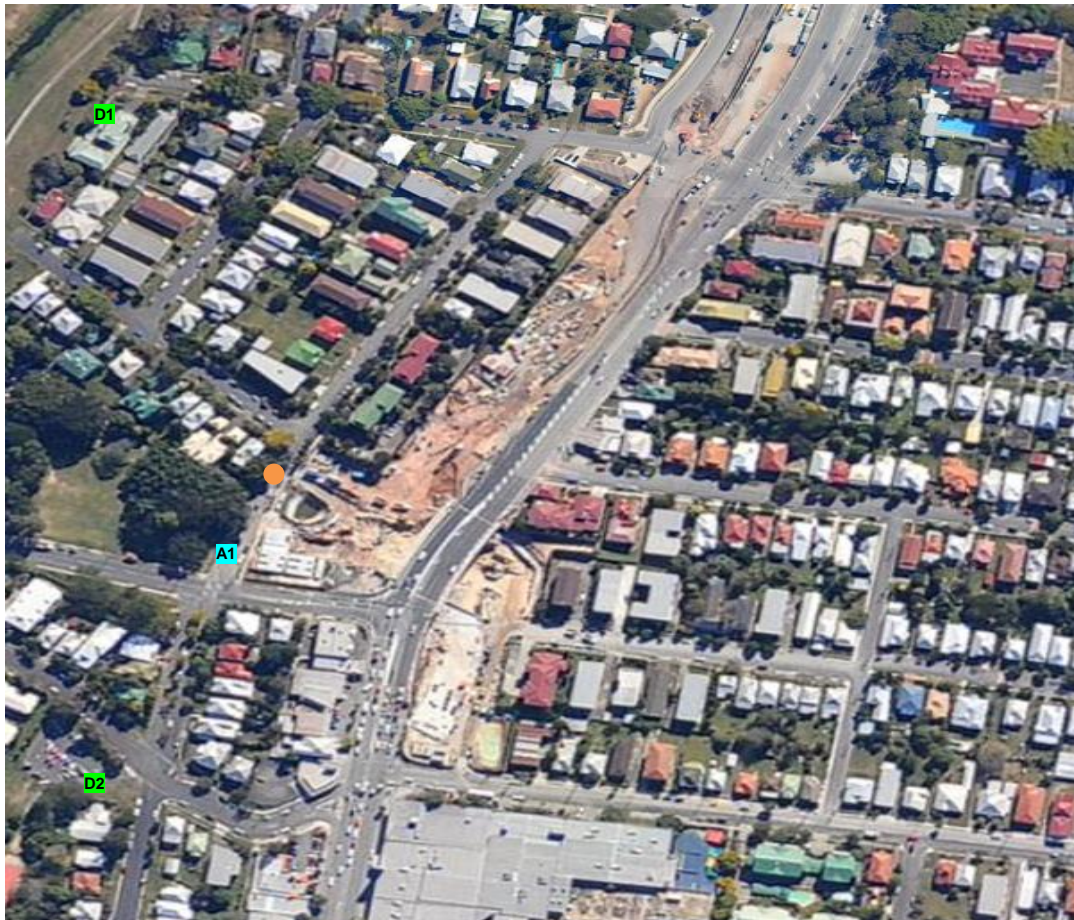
Truro Street Mid Tunnel Monitoring Locations
